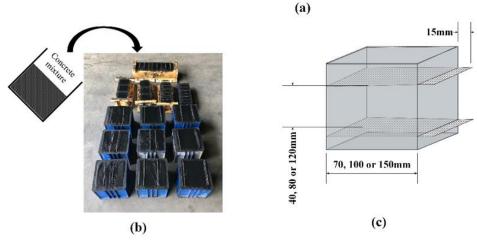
Specimen preparation: (a) Steps for mixing the SSC, (b) SSC specimen after casting, (c) Parameters of specimen dimension.
